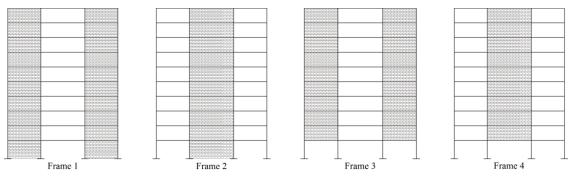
Alternative infill wall arrangements (Frame 1 to 4)
